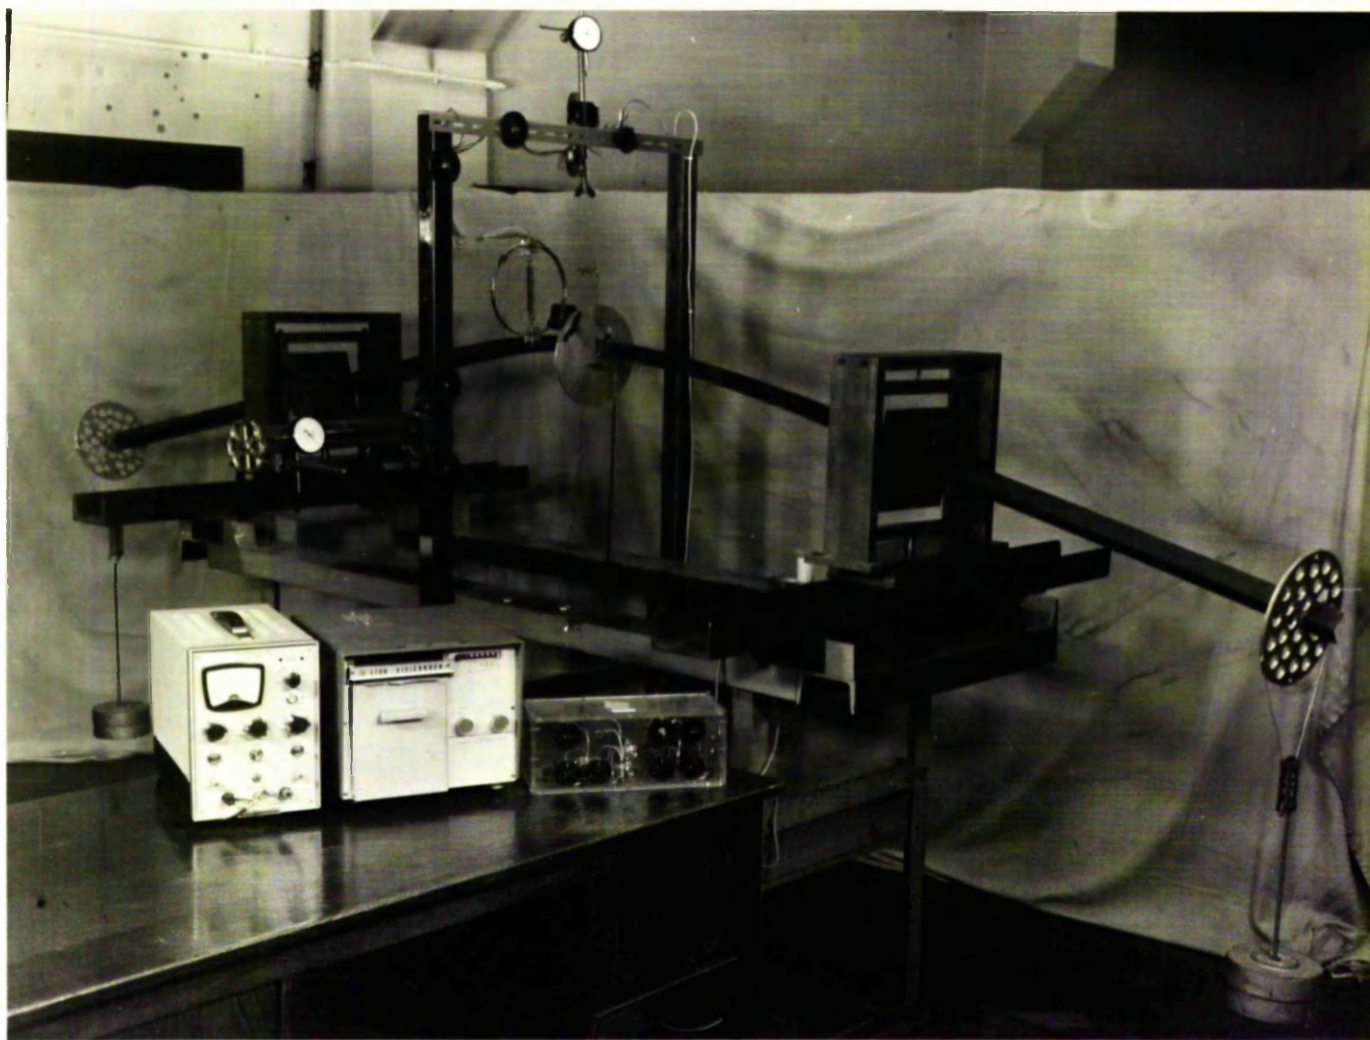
ANGLE SECTION BEAM AT FAILURE
